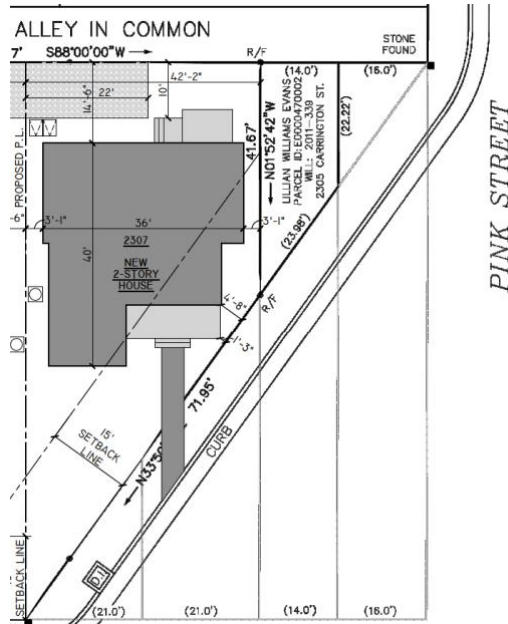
Site plan of proposed dwelling and intersection of Pink and Carrington Streets
